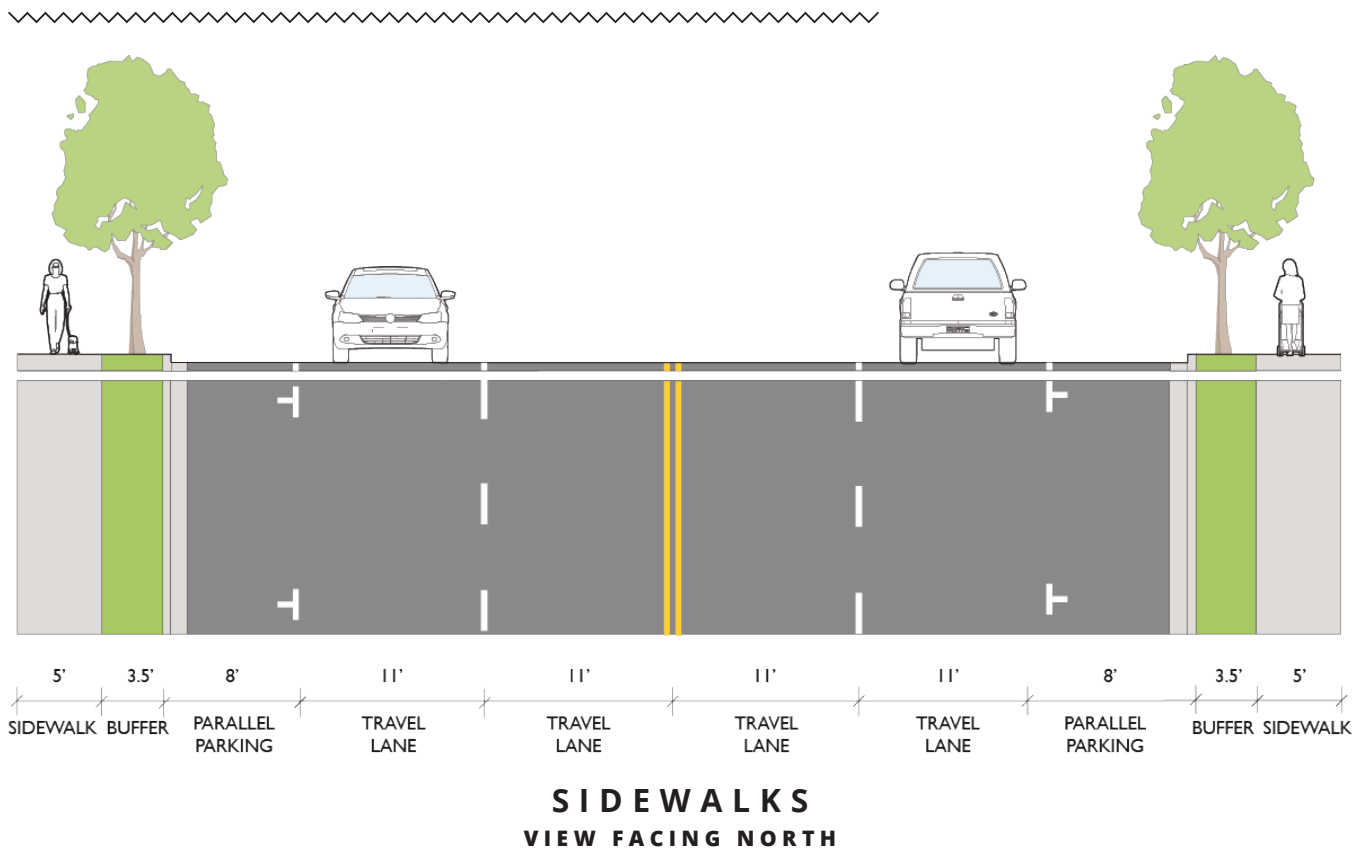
PALMETTO BLVD CROSS SECTION B
